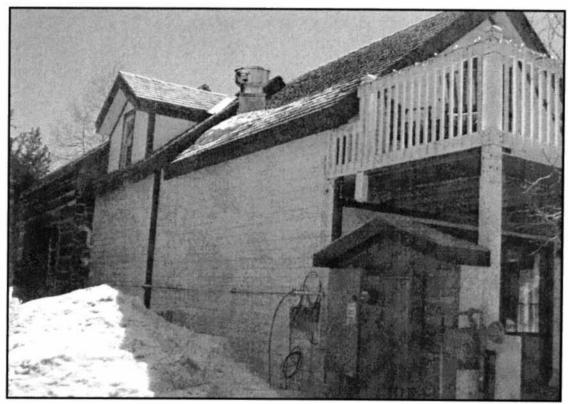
Rendering showing new proposed exhaust fan on backside of building.
